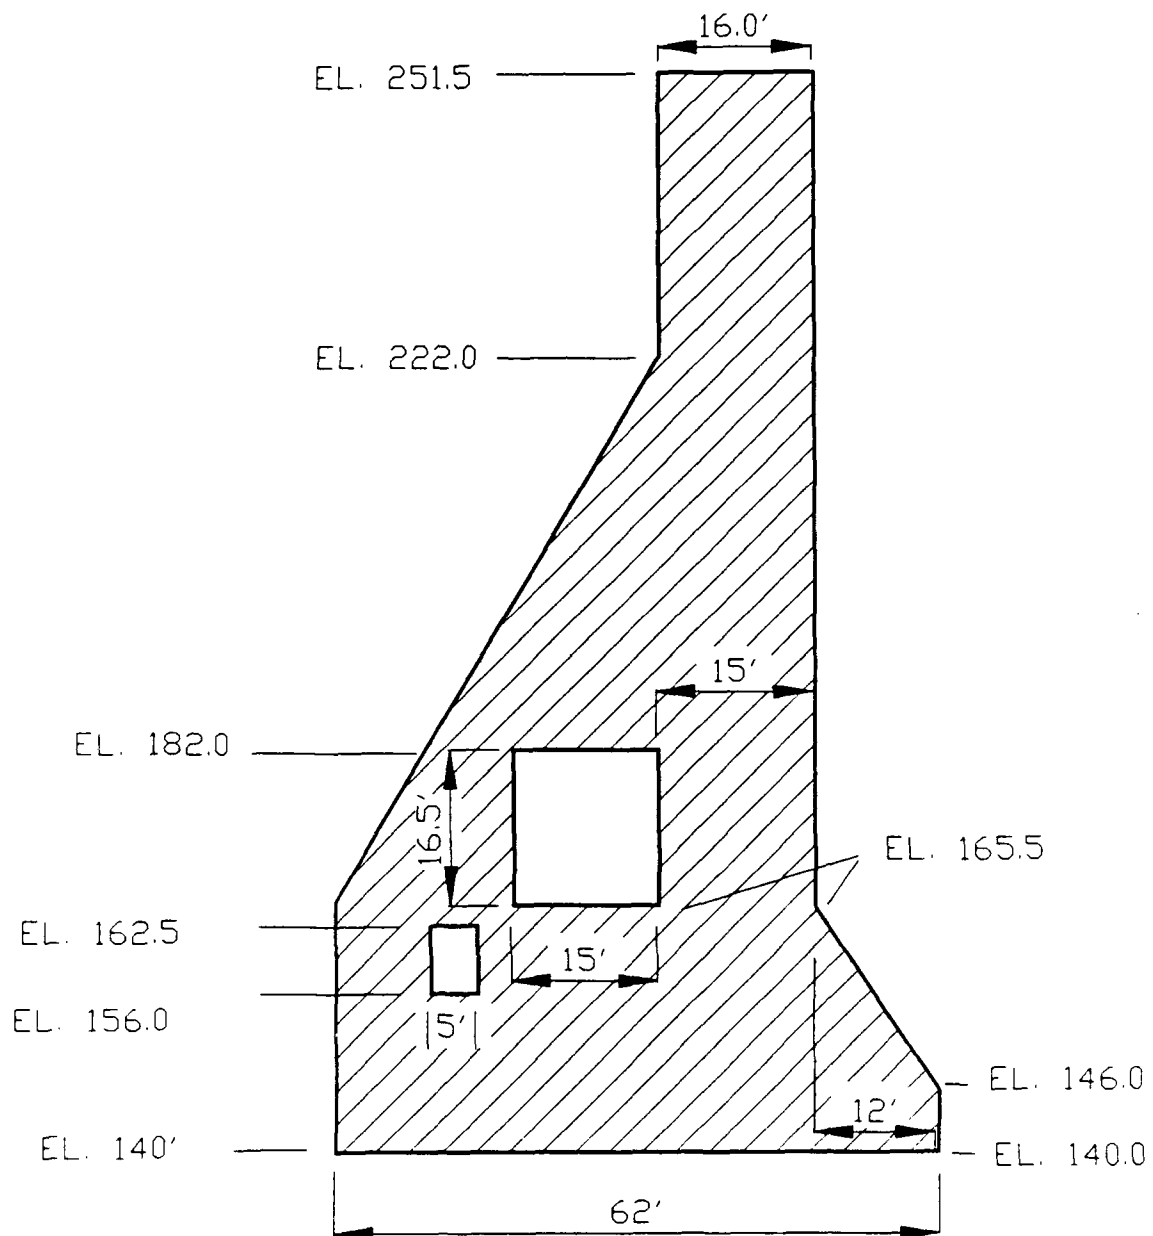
Basic elevations and dimensions for the model of south chamber wall monoliths at Eisenhower Lock
